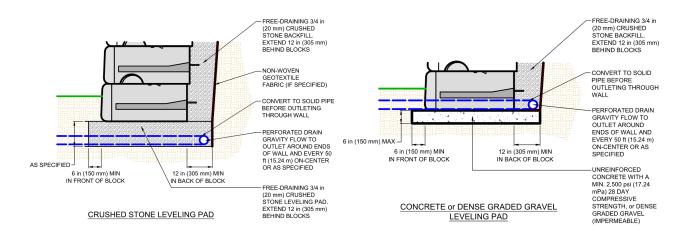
Leveling Pad Options for Retaining Wall Blocks
